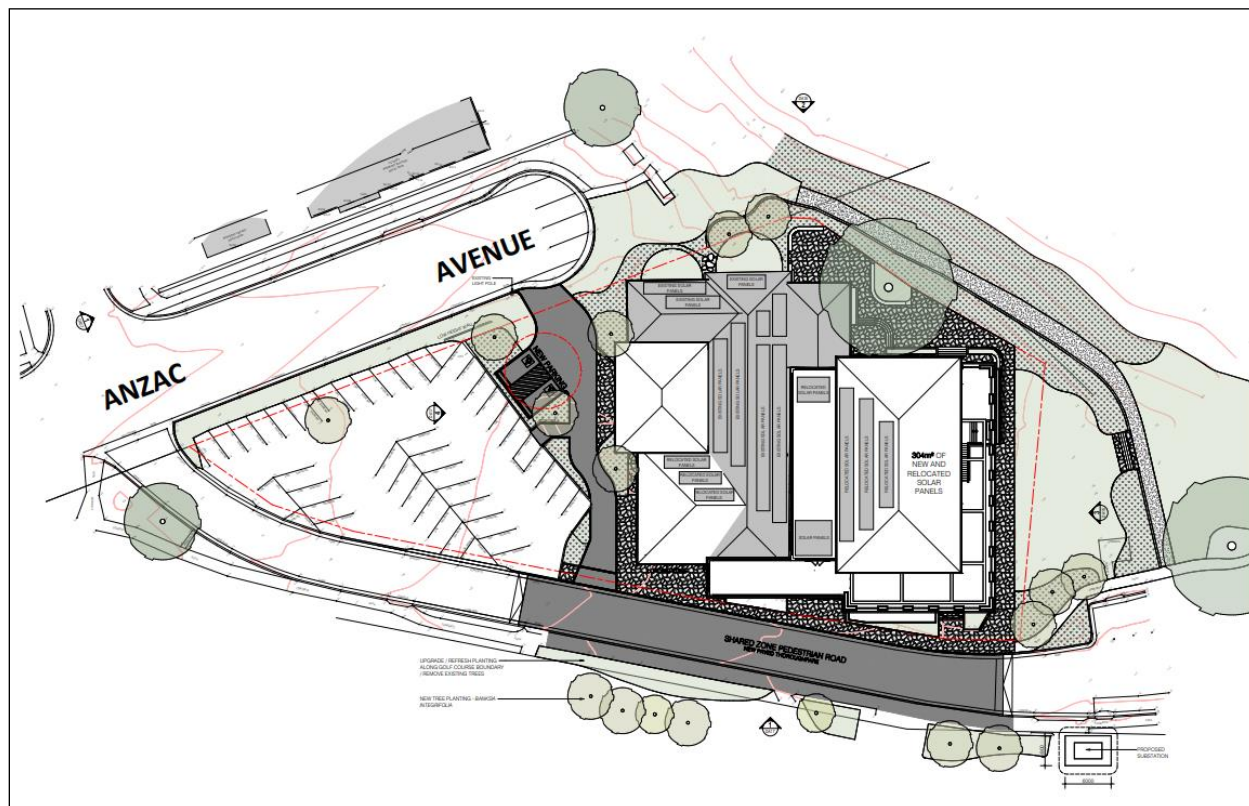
Proposed Building Footprint (Source: i2C; 2025)
